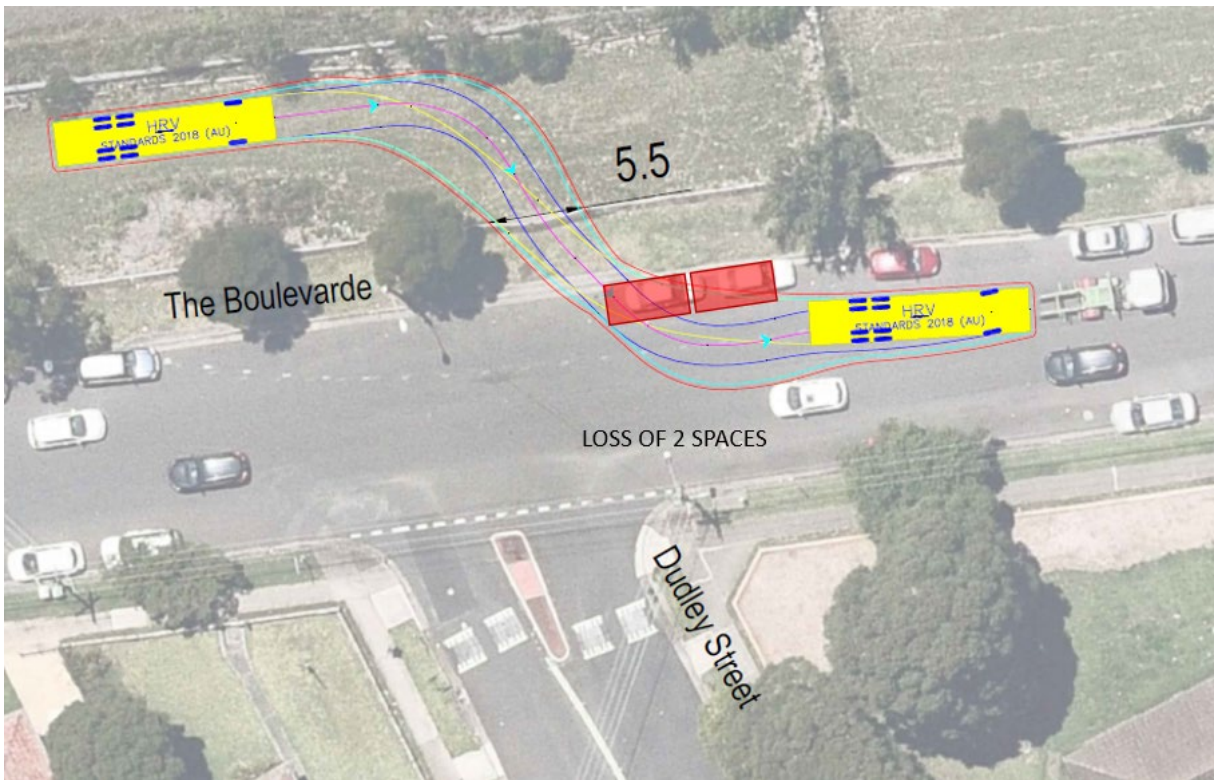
PB6 – M24 16.795D Parking Space Loss
